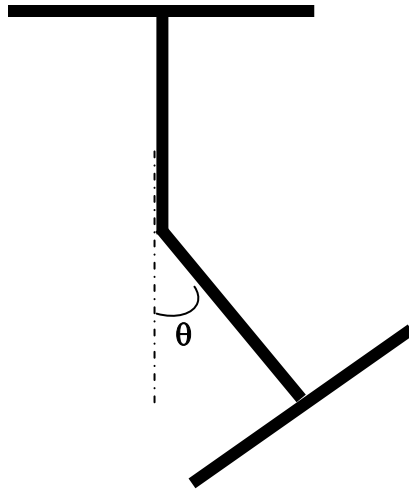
Bedi's suggested idealization of a cross-section of a damaged bridge girder
